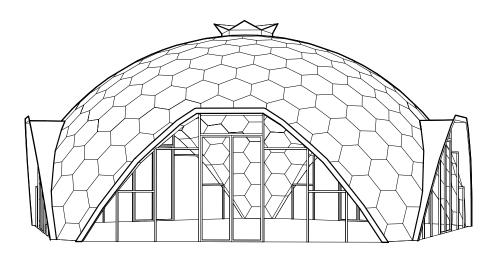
A plate shell designed by Pavlov, constructed from steel plates.
